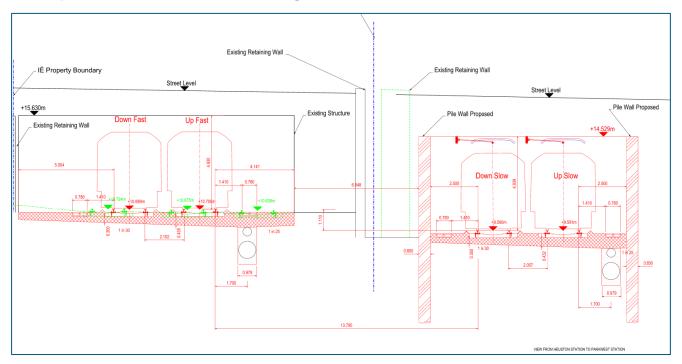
South Circular Road Bridge (OBC1) – Cross section at Ch 9+401, view from Heuston Station to Park West & Cherry Orchard Station
